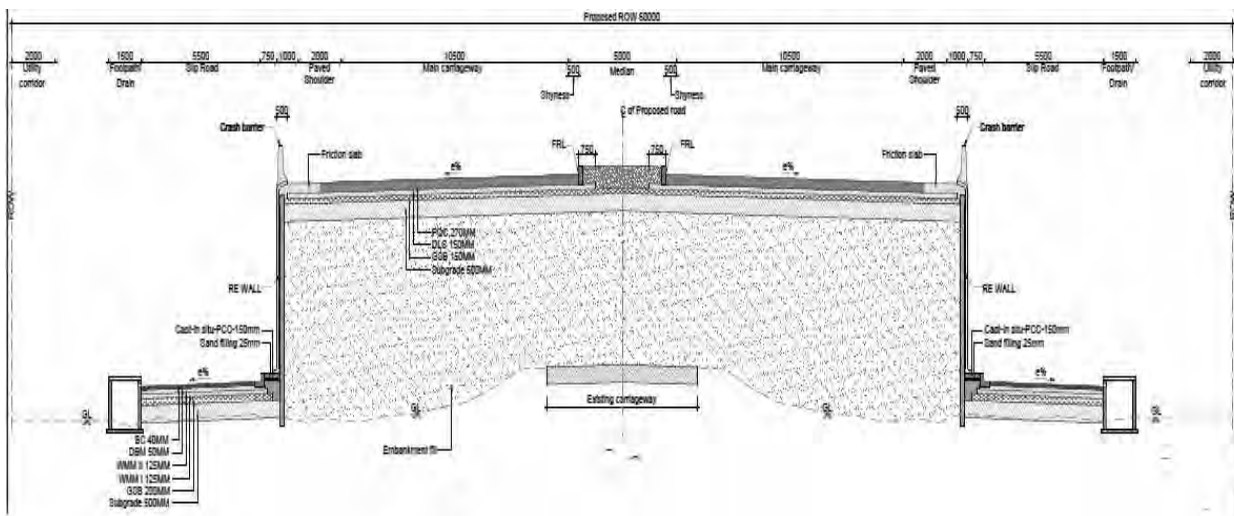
TCS-6A Typical Four Lane Underpass Cross Section with Slip Roads in the Existing Road
